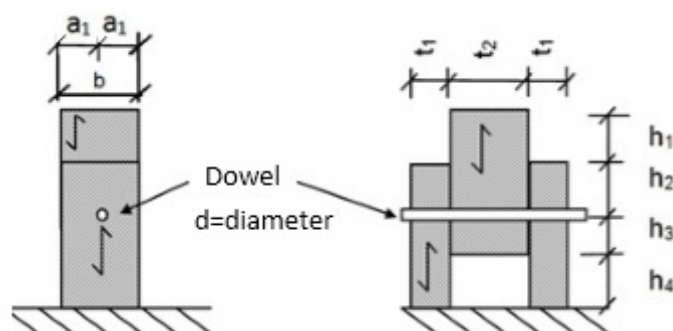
Dimensions and geometry of the dowel-type connection in double shear.
